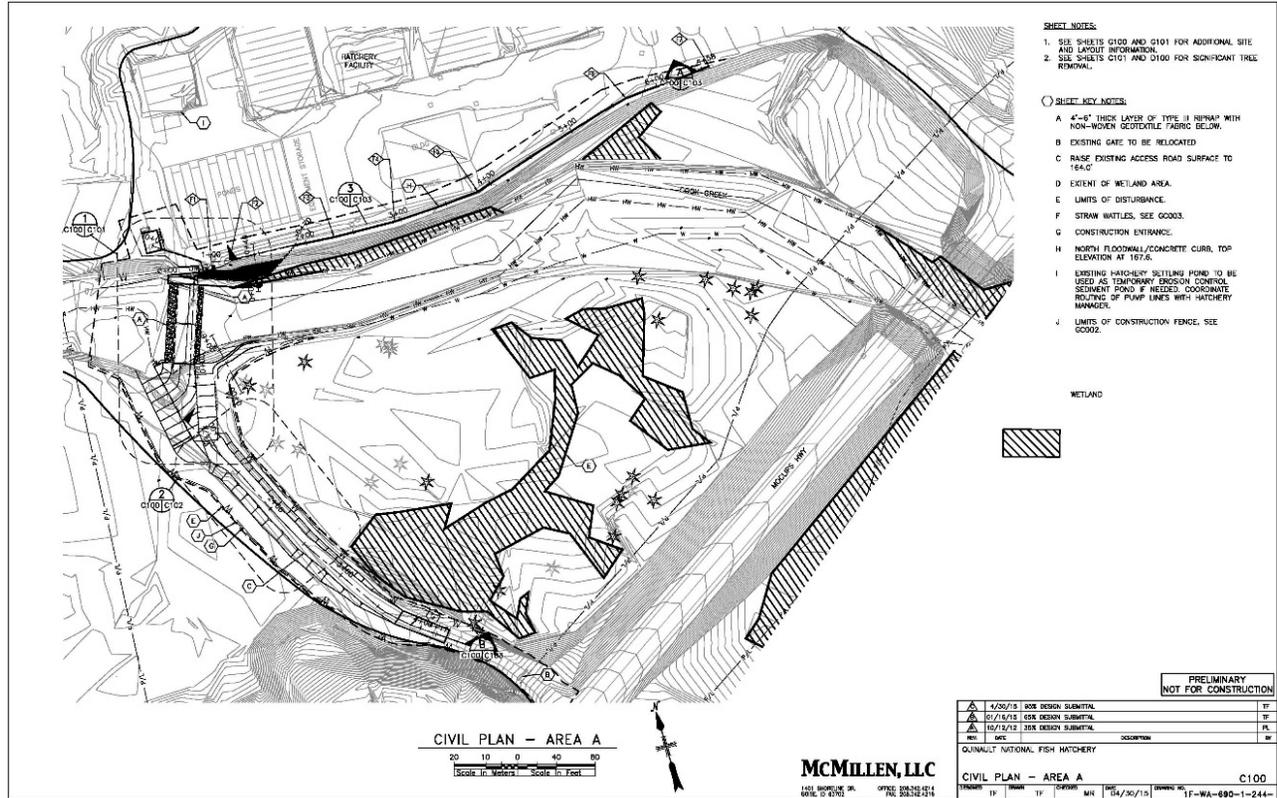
Engineering Drawing Noting Setbacks and Road Widening on the Access Road
